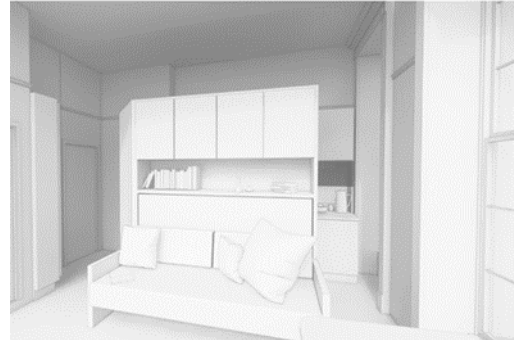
Concept 3d model of a typical 'pod' within a first floor room.
